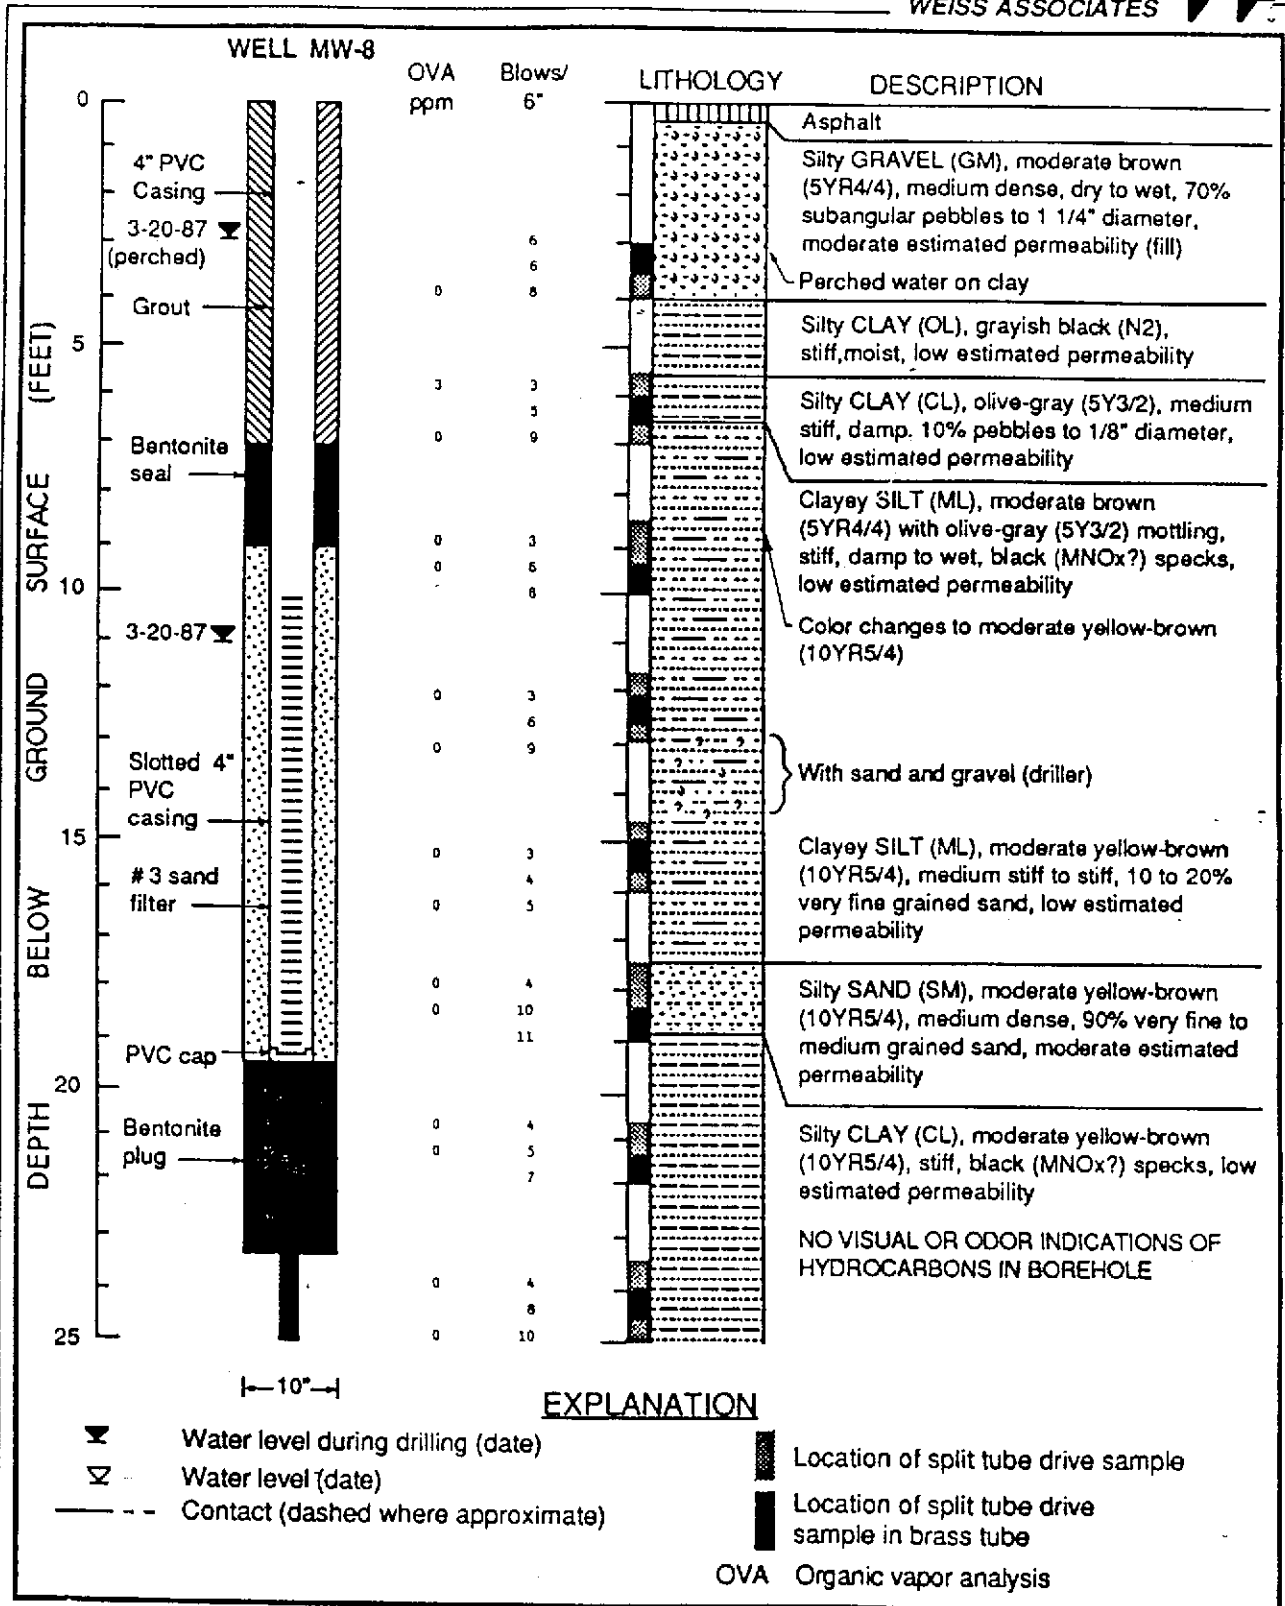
Well Construction Details and Subsurface Lithology - Well MW-8
